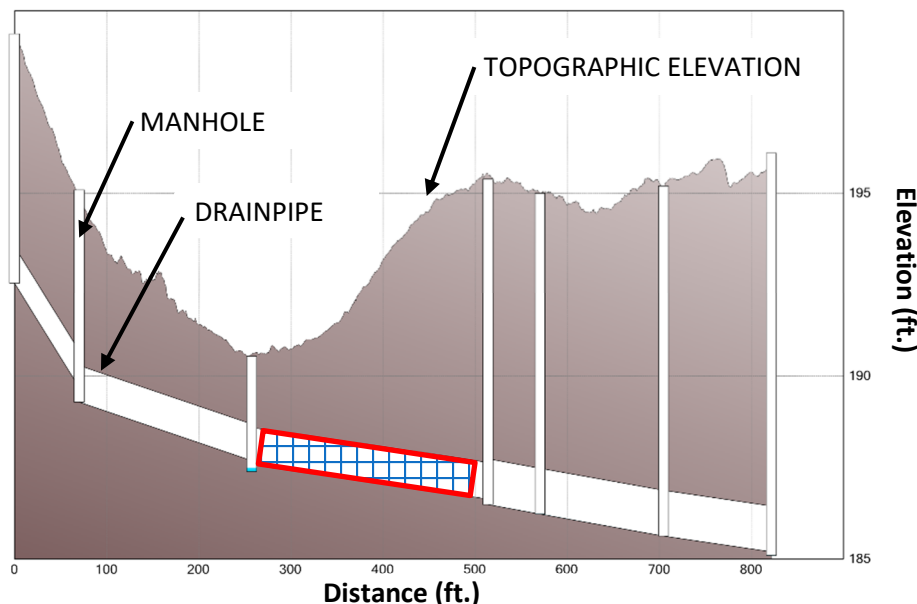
Existing drainage network profile along Cocasset Street. The 12-inch dia. CI pipe, which drains from low point at the railroad underpass, is highlighted in red.
